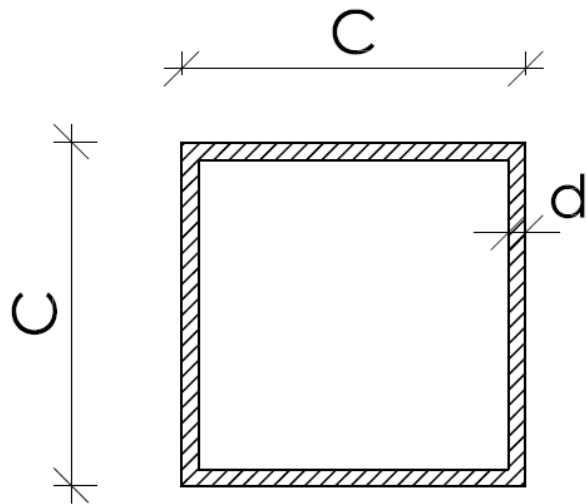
Core system cross section. The size of the core, C , is set. Then the core wall width, d , is calculated to limit the deformation to a maximum of $L/500$.
